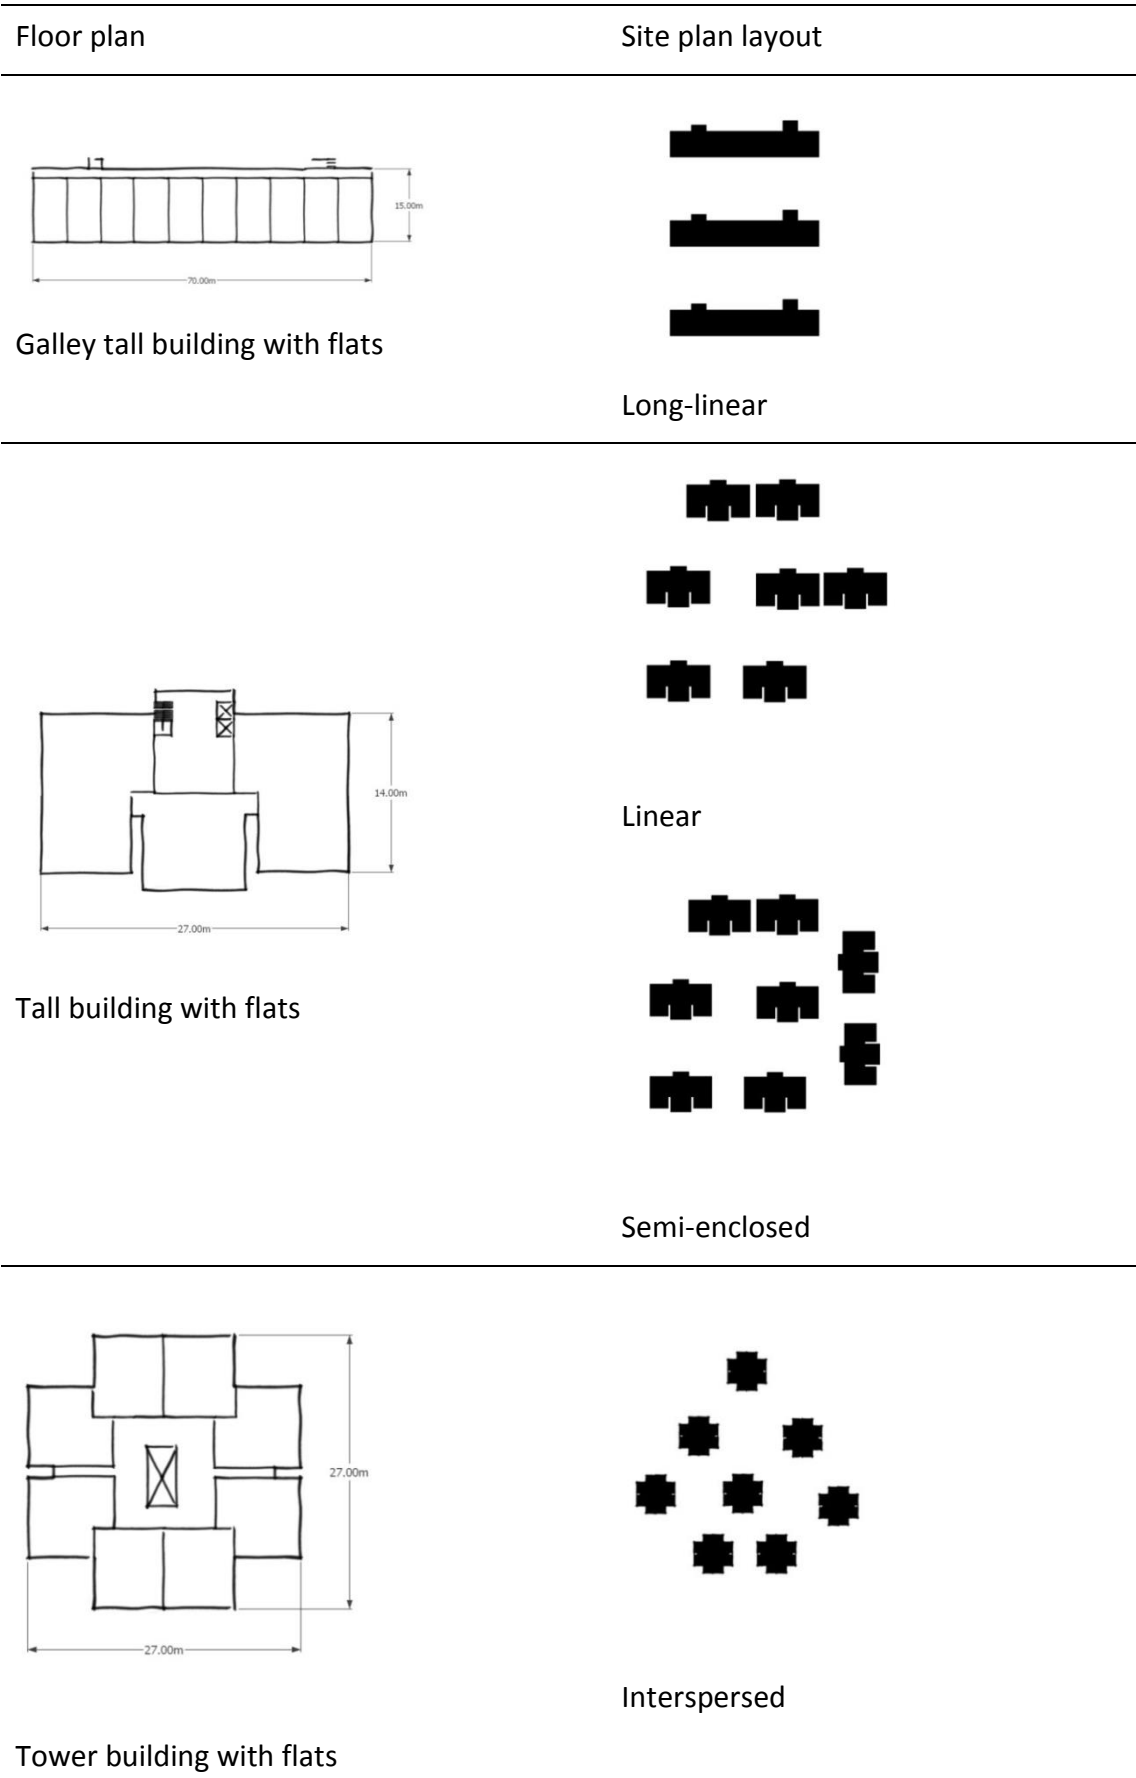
Typical building floor plans (left) and residential urban forms (right) in Shanghai. Figure redrawn from Yang et al. (2011).
